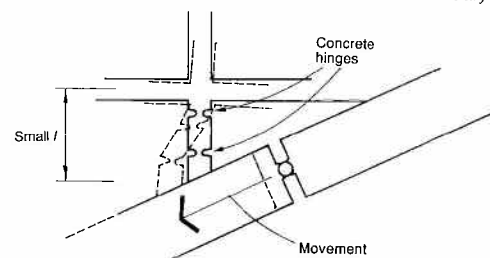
(c) Concrete hinges introduced in short end members at boundary
